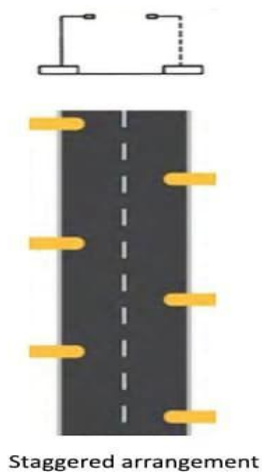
Staggered arrangement (two-sided arrangement offset)
